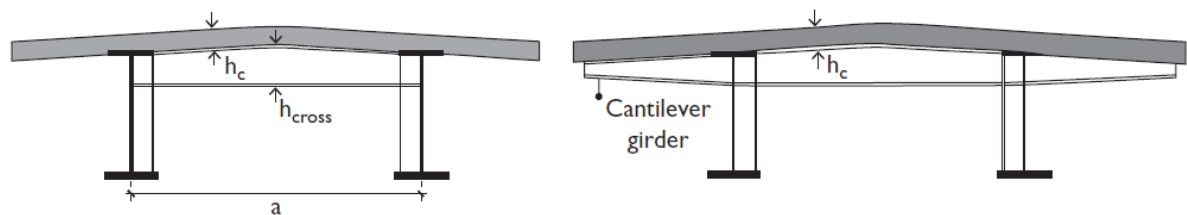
Schematic overview of cross girder supporting deck slab [13]
